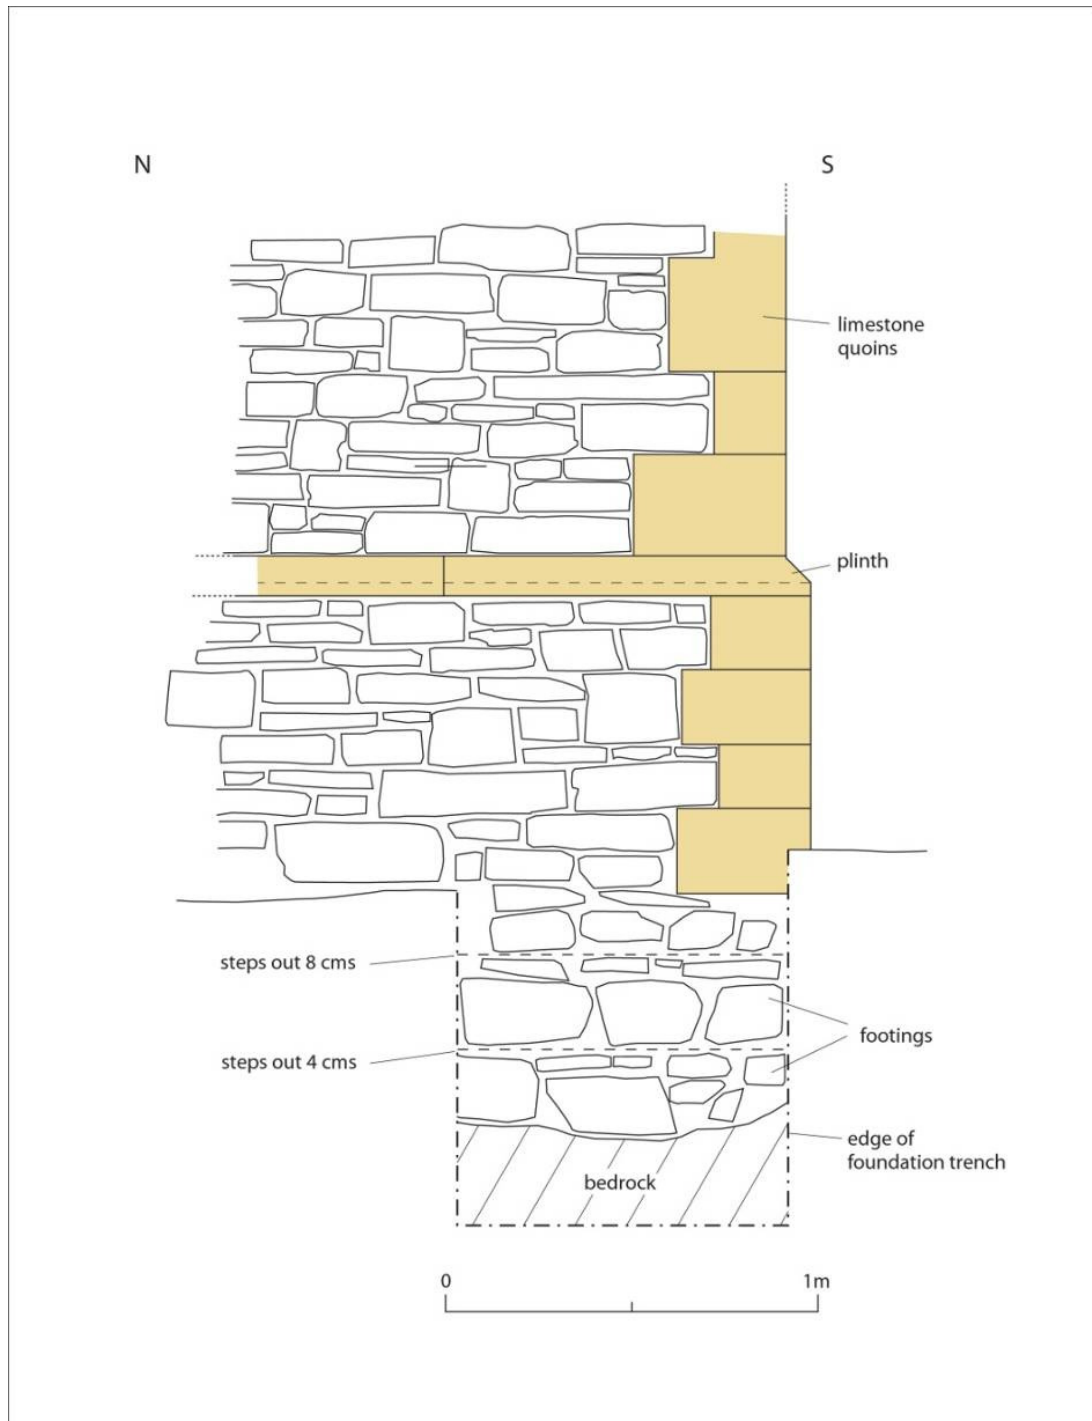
West facing elevation above trench A where it exposed the foundations of the southwestern corner of the Old School, St David's
